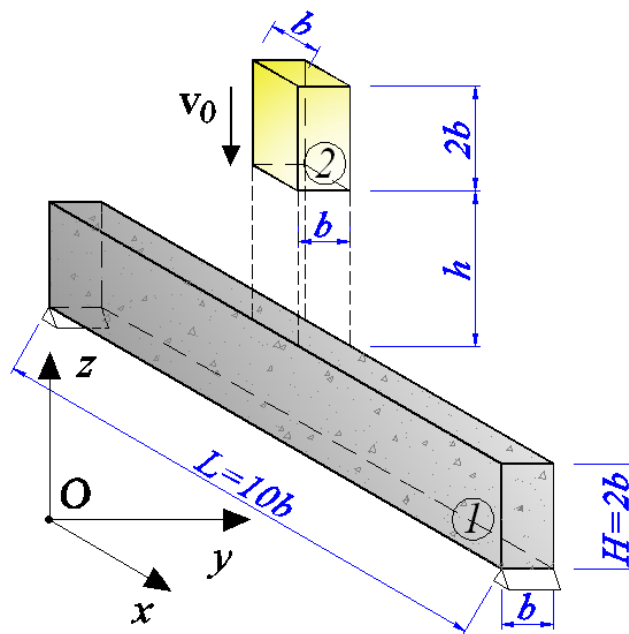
Simply supported plain concrete beam under impact load [1].
